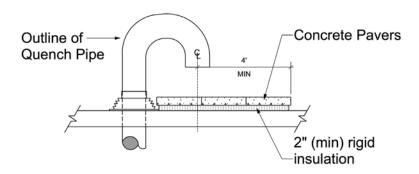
Diagrammatic illustration of a sacrificial roof protection assembly. (Image used with permission from RAD-Planning)
